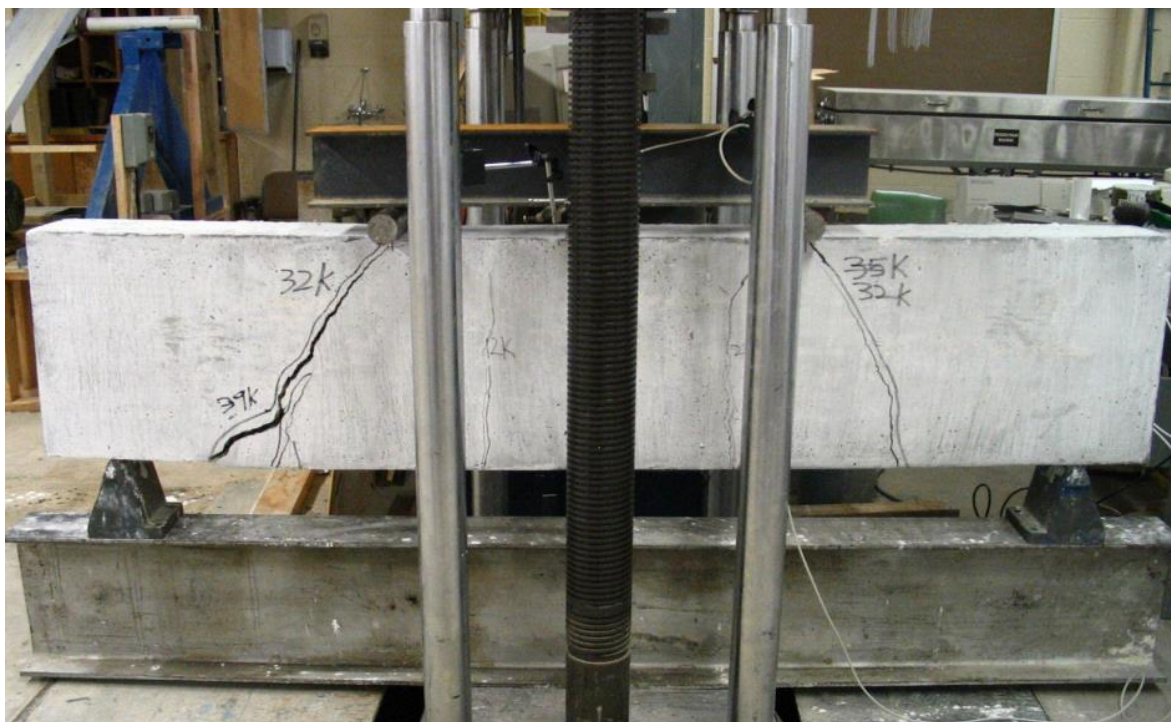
Failure of bamboo reinforced concrete beam under four-point bending test due to shear (Khare 2005)
